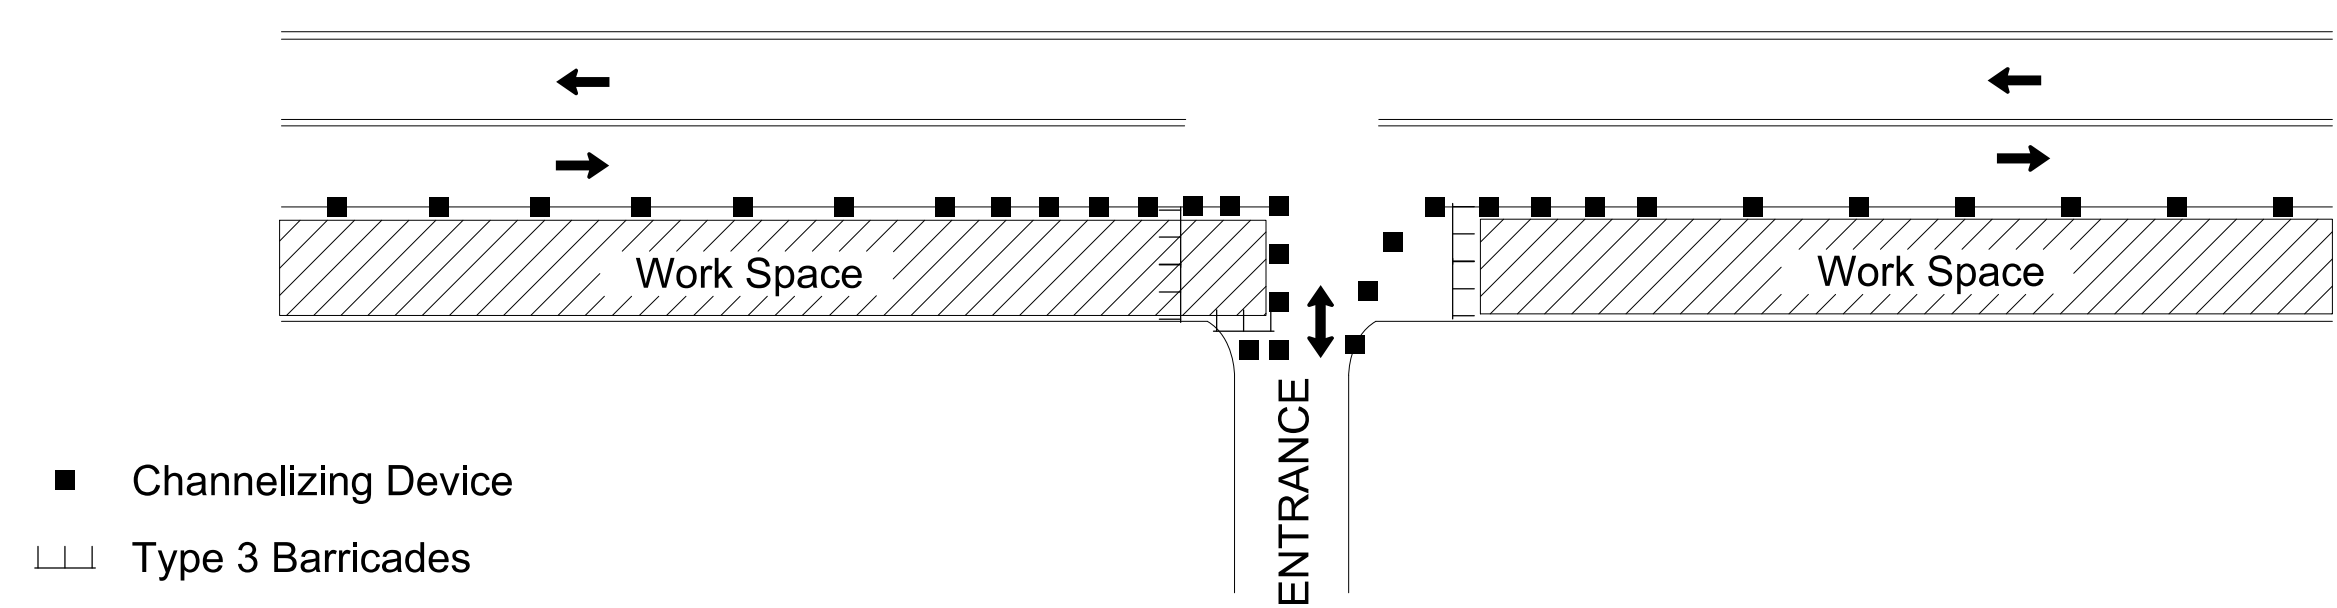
SIDE ROAD OR ENTRANCE CONSTRUCTED HALF AT A TIME: TWO WAY TRAFFIC REQUIRED
